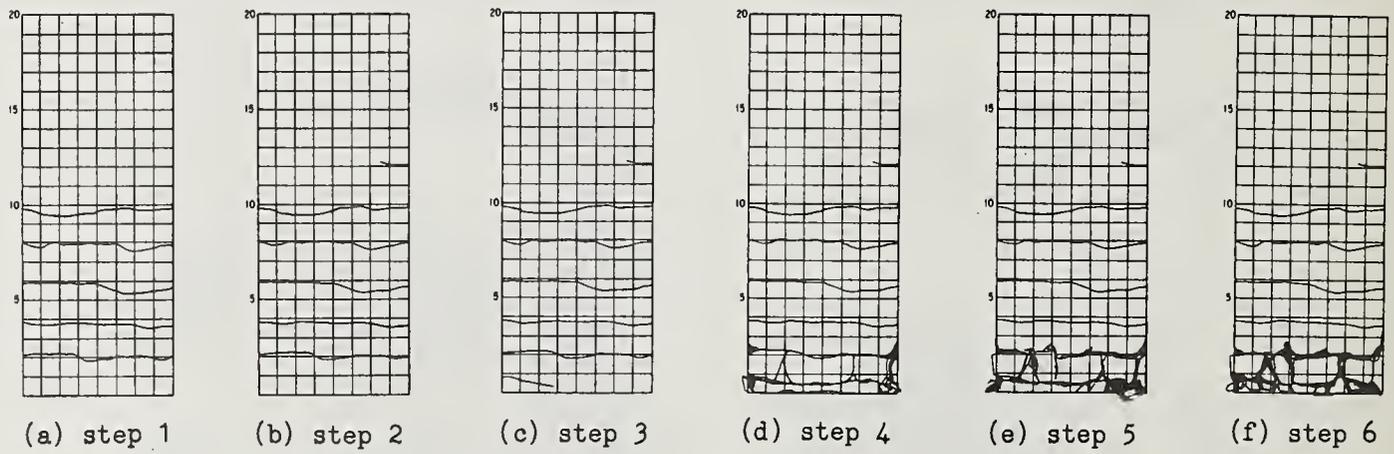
Failure Mode for Specimen with Bilateral Loading (P-49)
